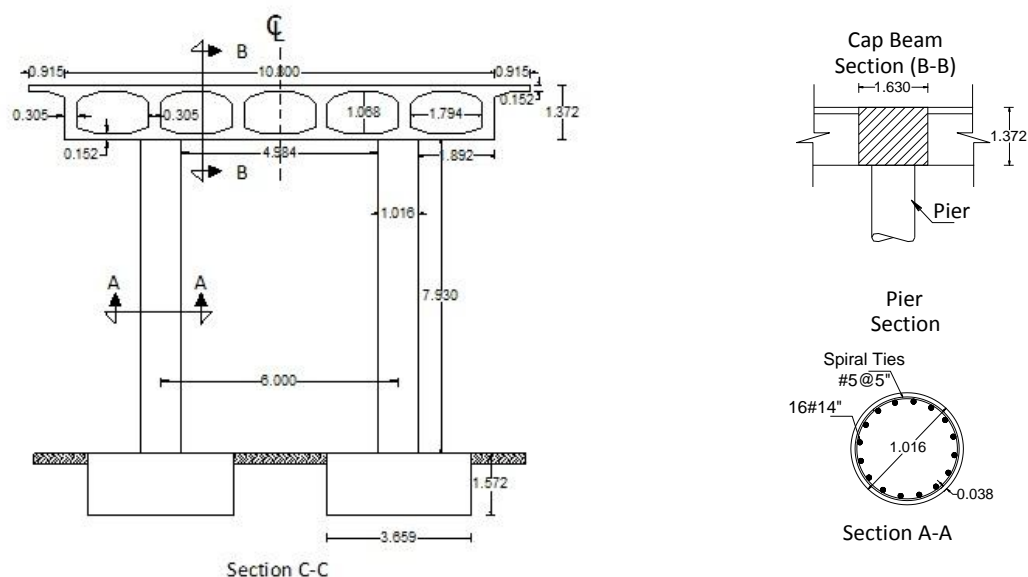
Typical Cross Section (Bent Frame) of the Multi-Span Bridge Models (all dimensions shown given in meters).
